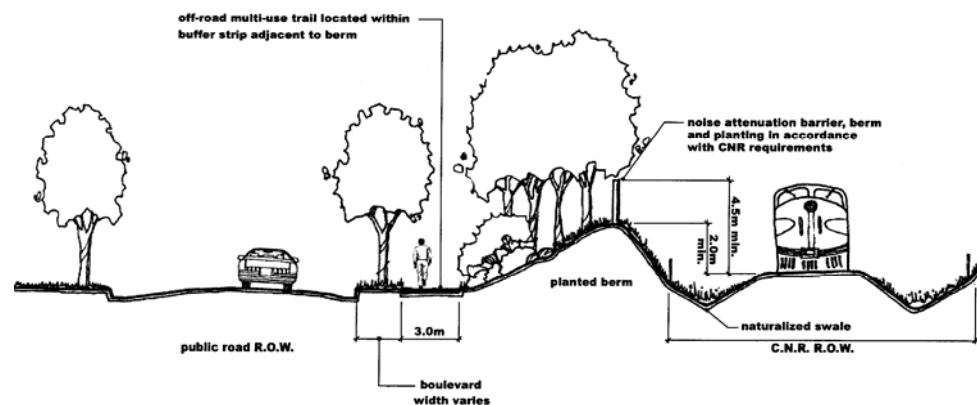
Typical cross-section of a cycling facility adjacent to a rail corridor separated by a planted berm.
